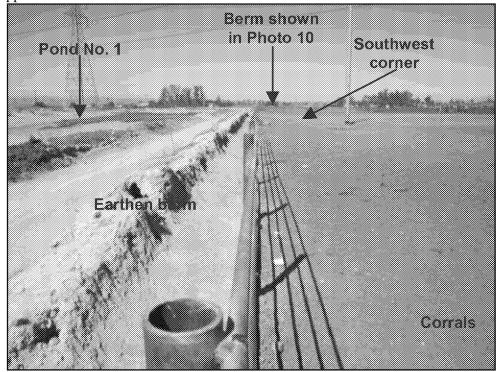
View facing southwest of Bellgrave Channel that runs along the northern perimeter of the Facility.
